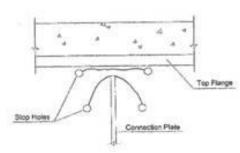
Crack-Stop Holes at Fatigue Cracks (Roddis and Zhao 2001)
